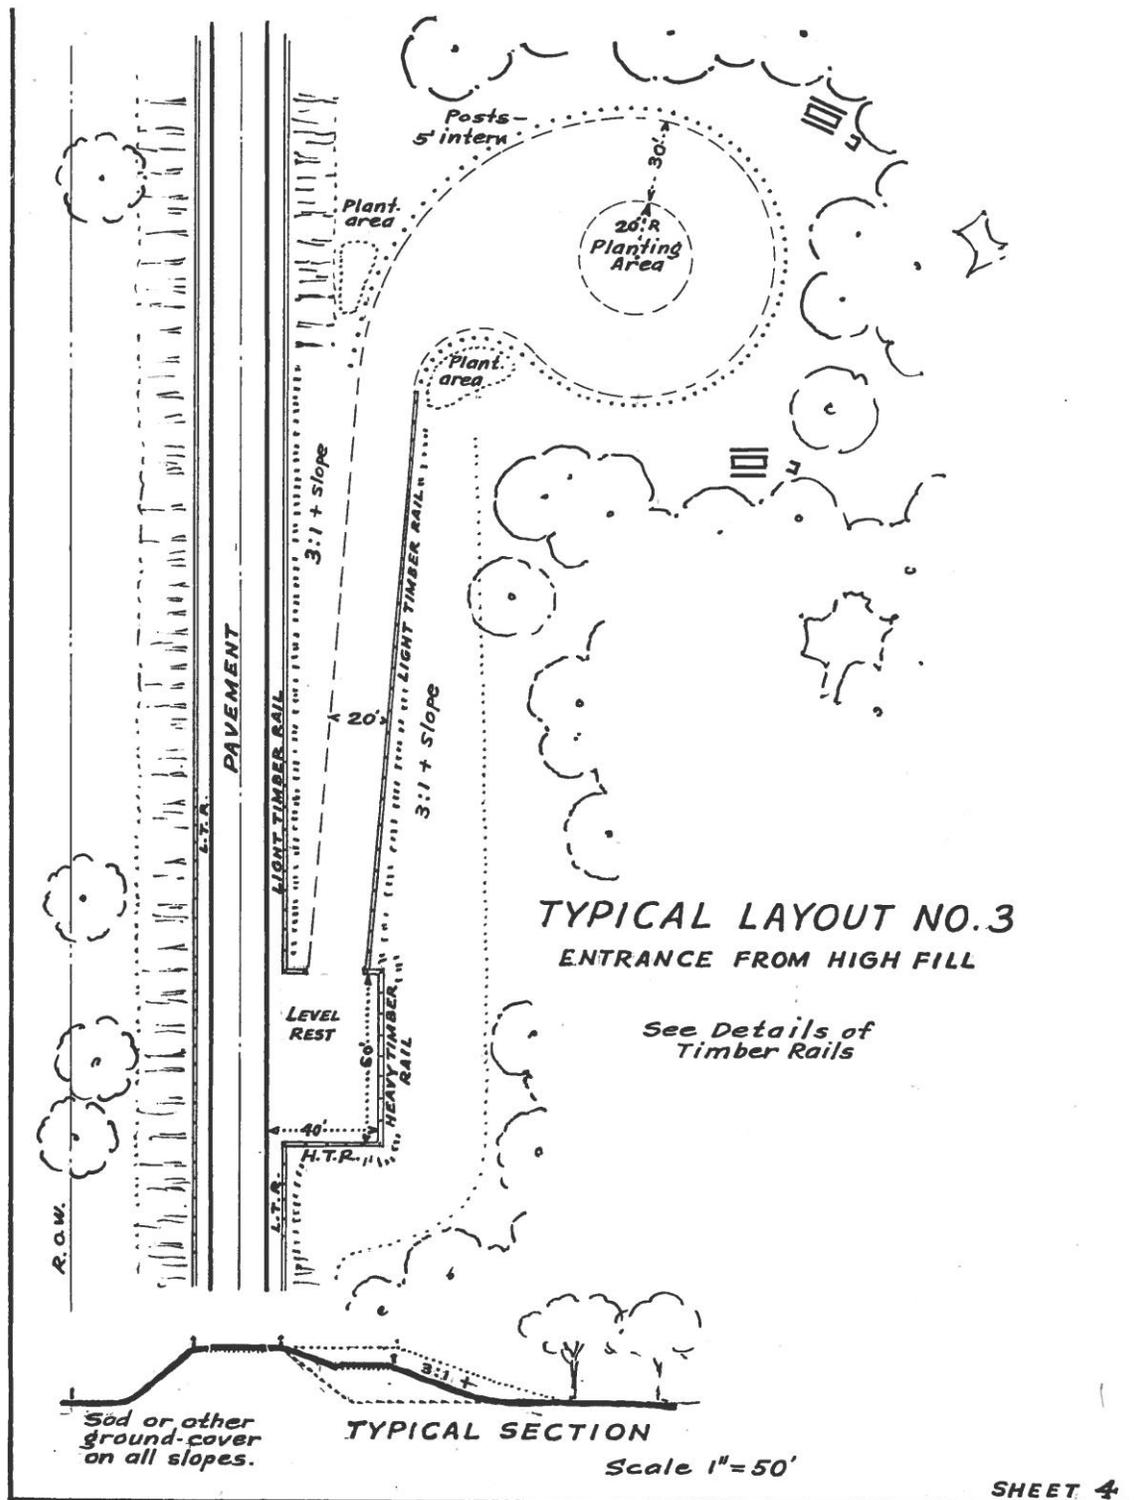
Typical roadside park layout no. 3 designed by Gubbels (1936).
